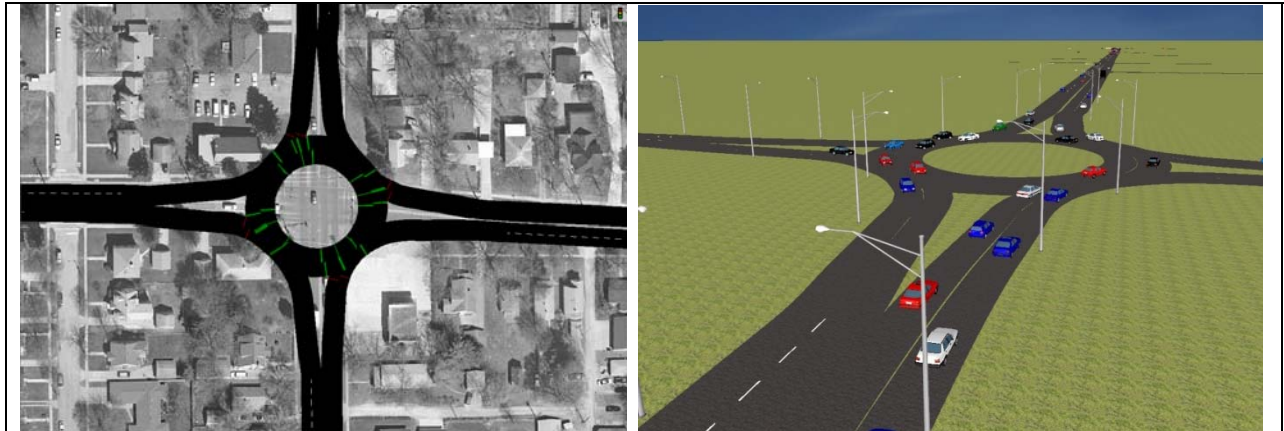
Roundabout alternative at 13th Street and Grand Avenue (Image Source: Story County, Iowa)
